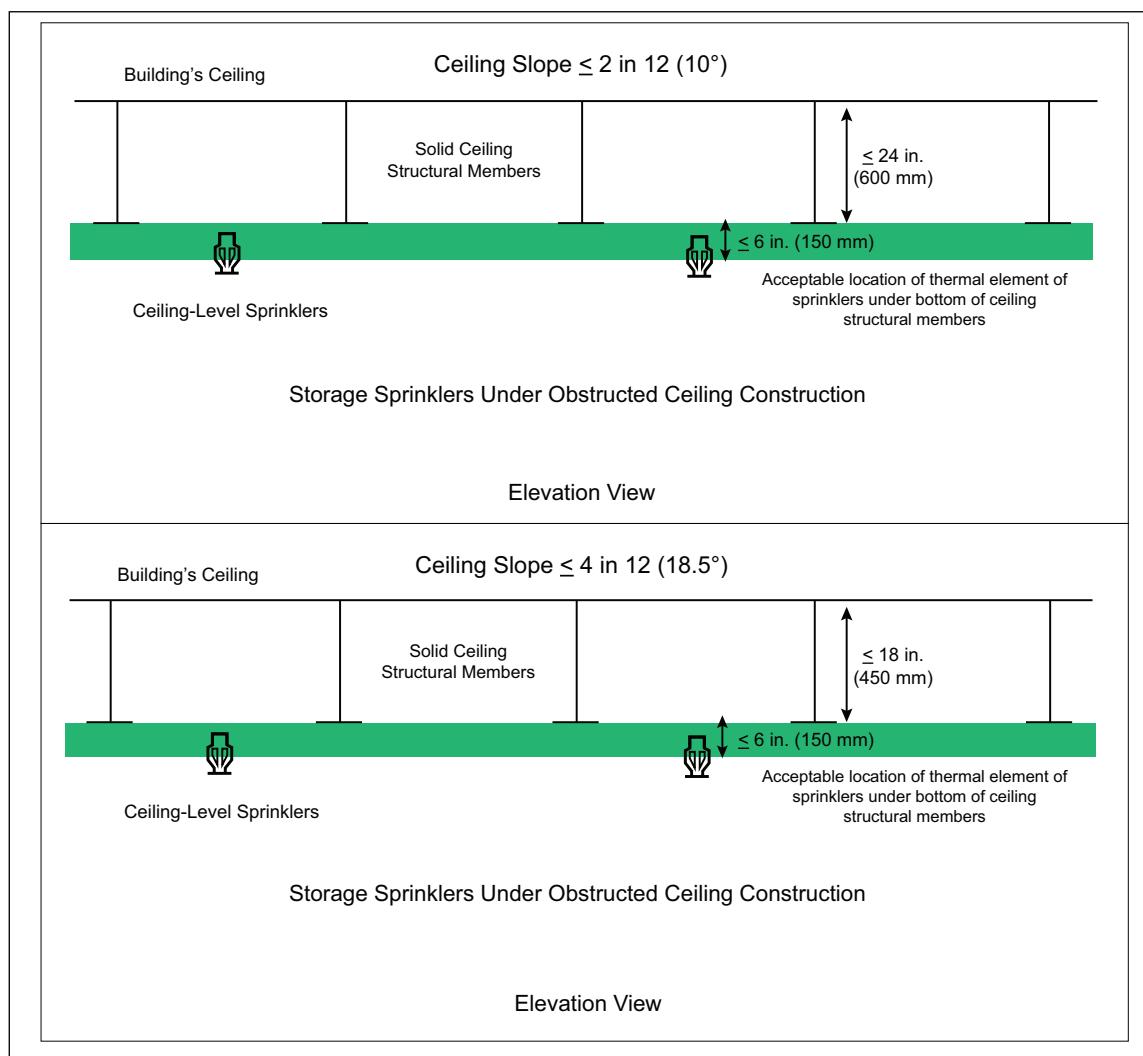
Vertical location of Storage sprinklers under obstructed ceiling construction for ceiling slopes of (a) up to 2 in 12 (10°), and (b) up to 4 in 12 (18.5°)
